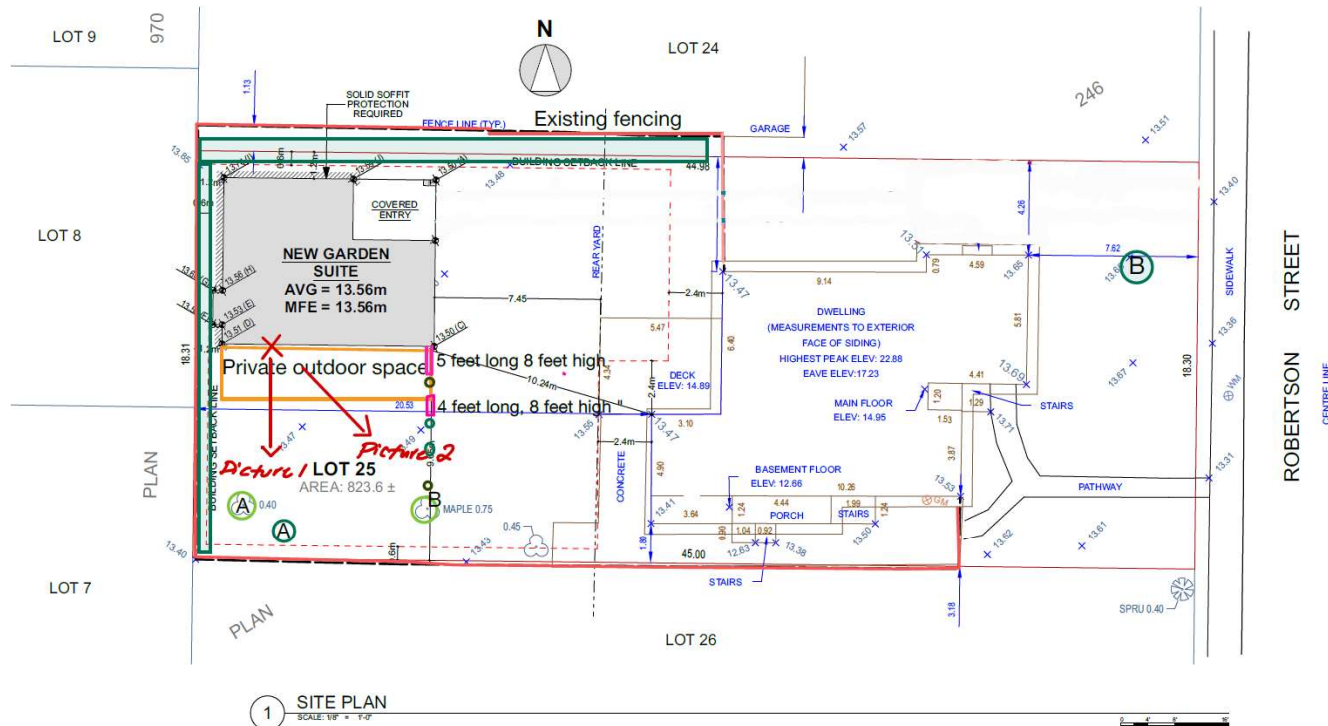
Landscape plan: The locations and directions from where I took photographs shown in Pictures 1-2
